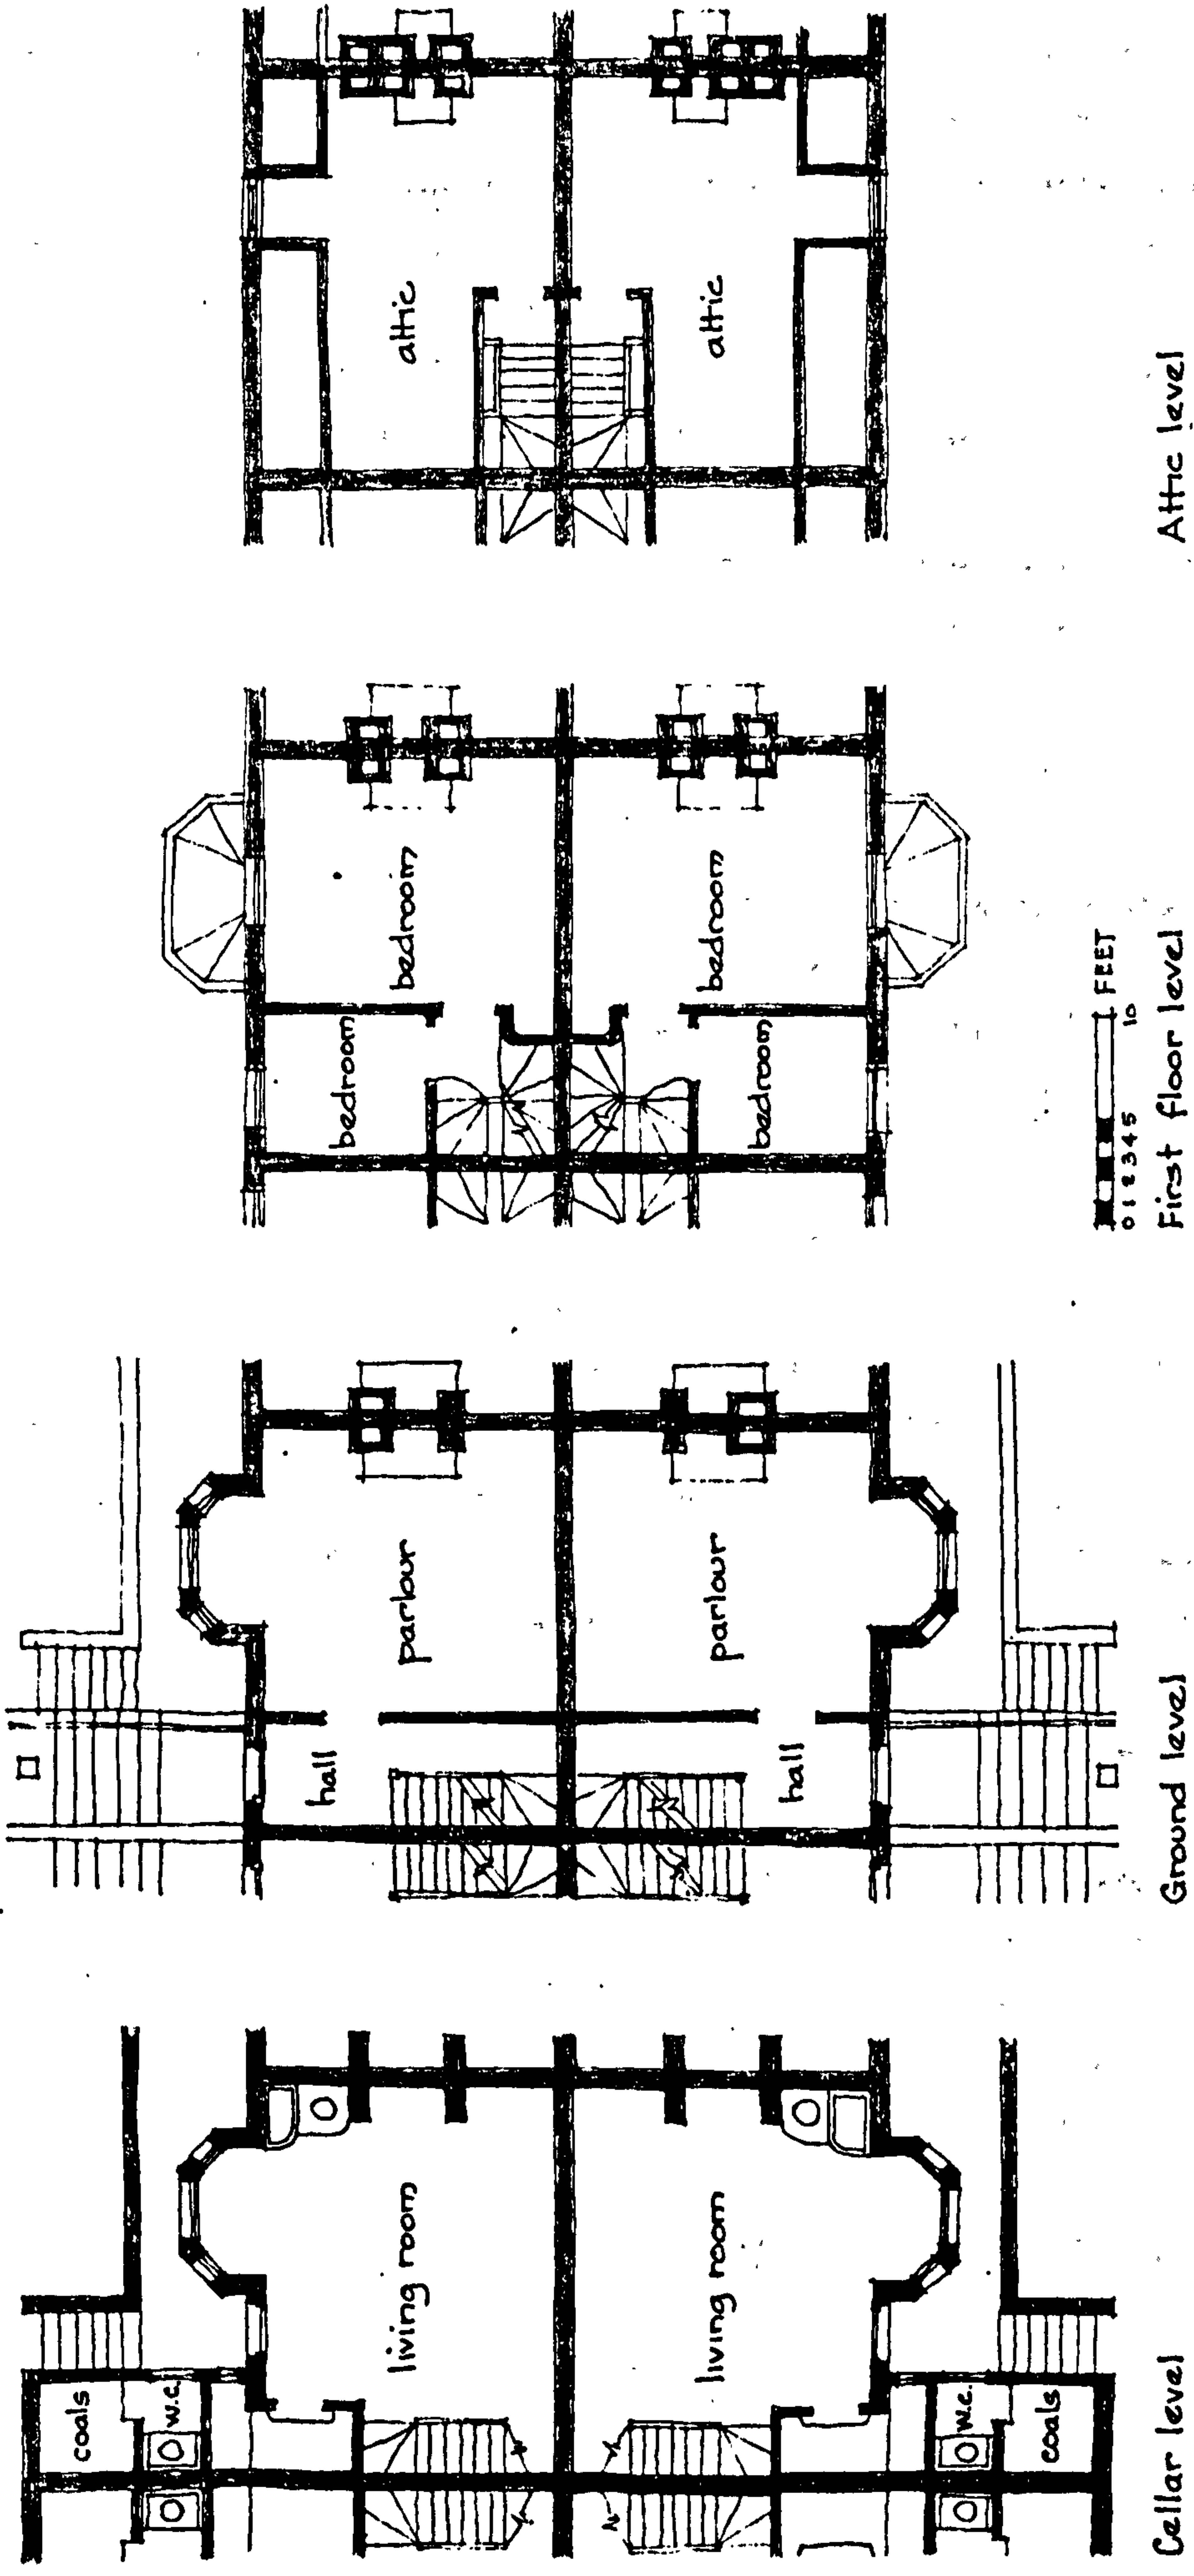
Floor plans of scullery back-to-back dwellings approved but not erected in the study area (W.N. Wynn 1886).
